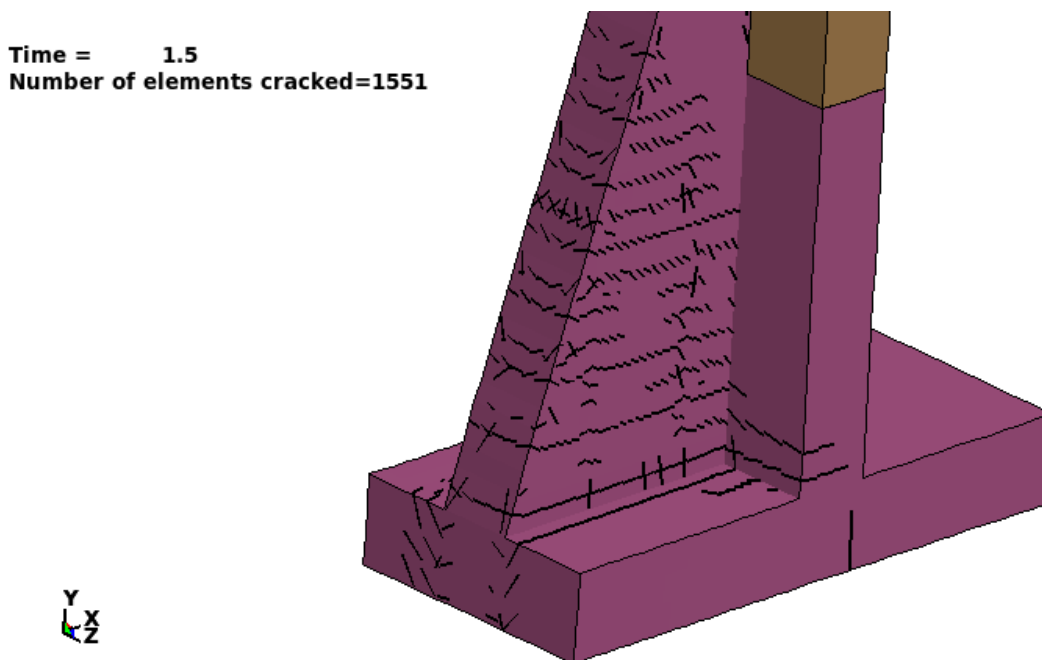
Damage to counterfort wall (Winfrith with cracking 280 psi).
